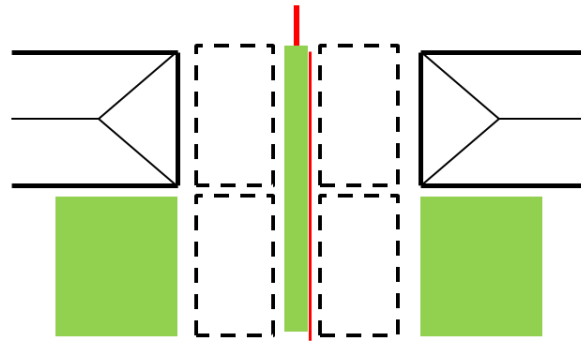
above: *Landscape buffers can be provided between adjoining tandem parking arrangements, to avoid excessive amounts of tarmac/paving
